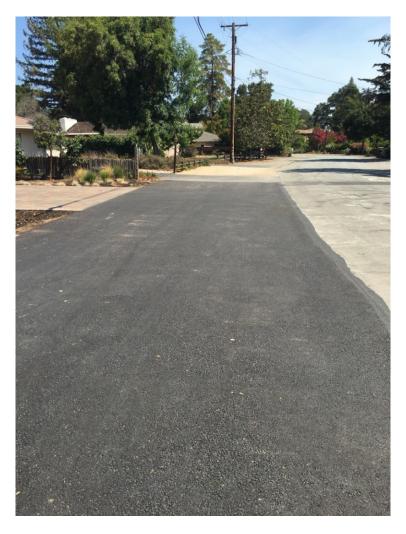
Asphalt used in shoulder parking and drainage swale area (NCE)
